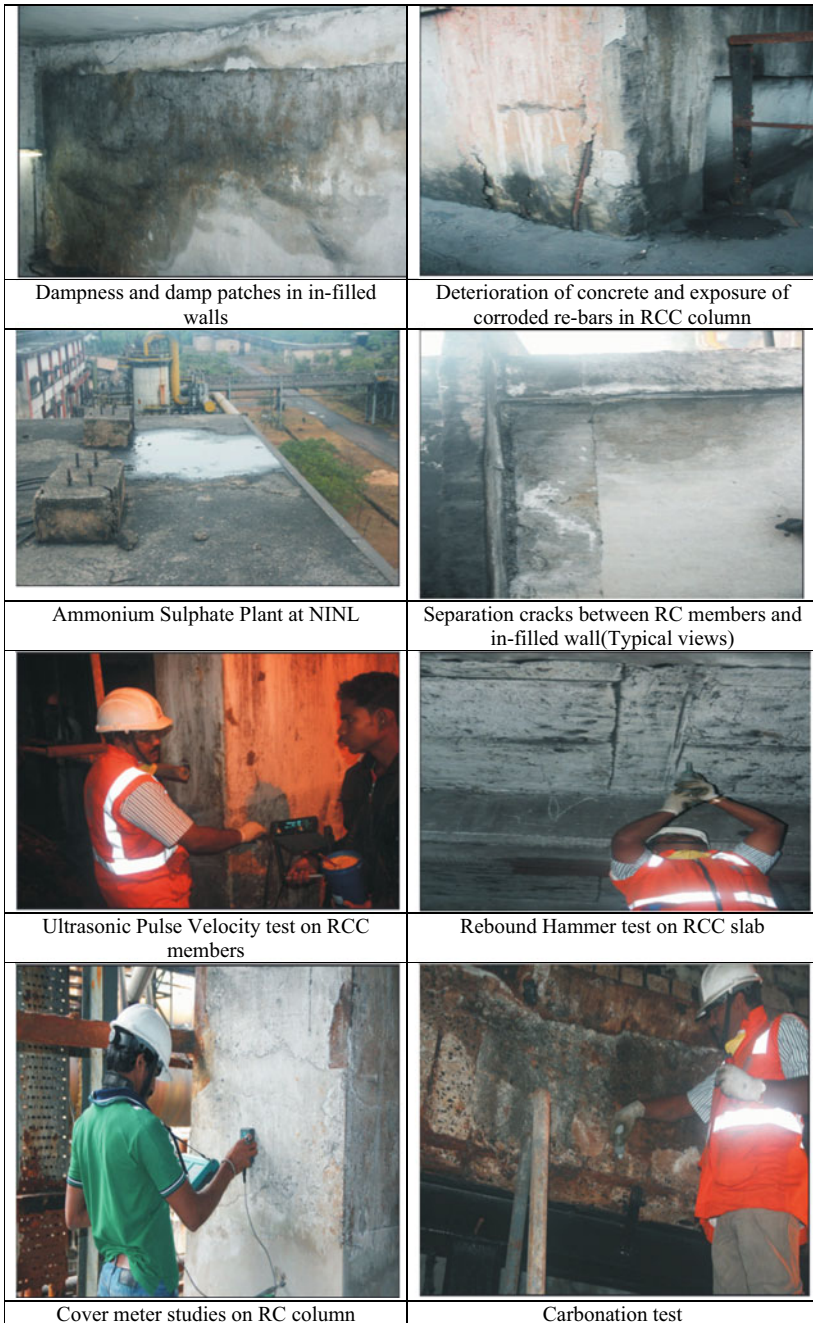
Overview NINL ammonium sulphate plant dilapidated building, structures and testing
